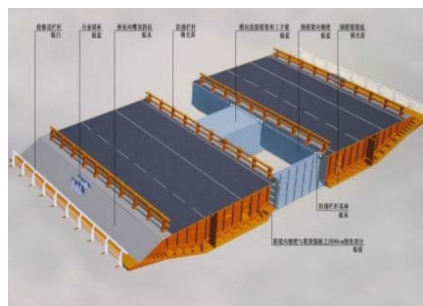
Segment of Main Girder of the Xihoumen Bridge
